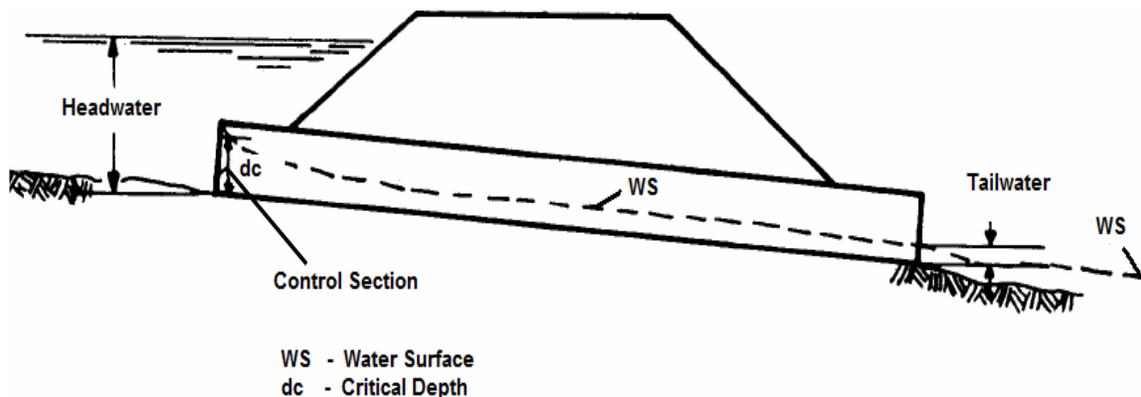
Typical Flow in a Partially Full Culvert (Source: FHWA, 2001)
